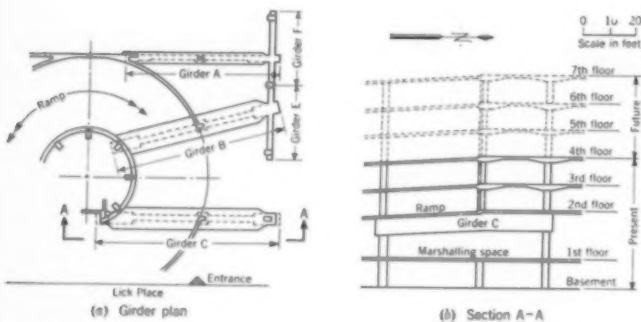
Plan and section show unusual column and girder layout. Irregularity of design was due to need for open marshaling area on first floor and to site shape.
